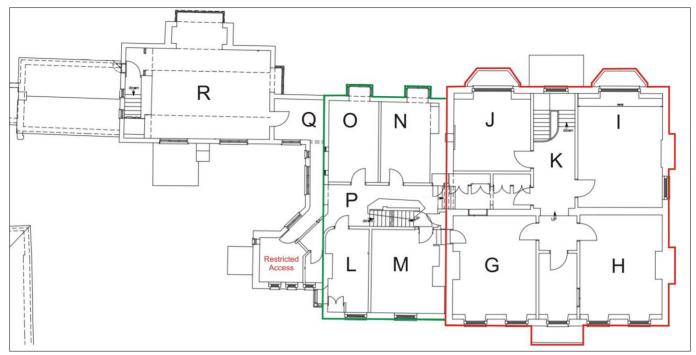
Existing First Floor Plan of the Project Site. Main Block outlined in red, main extension outlined in green. Lettering is to aid interpretation of the following description.
